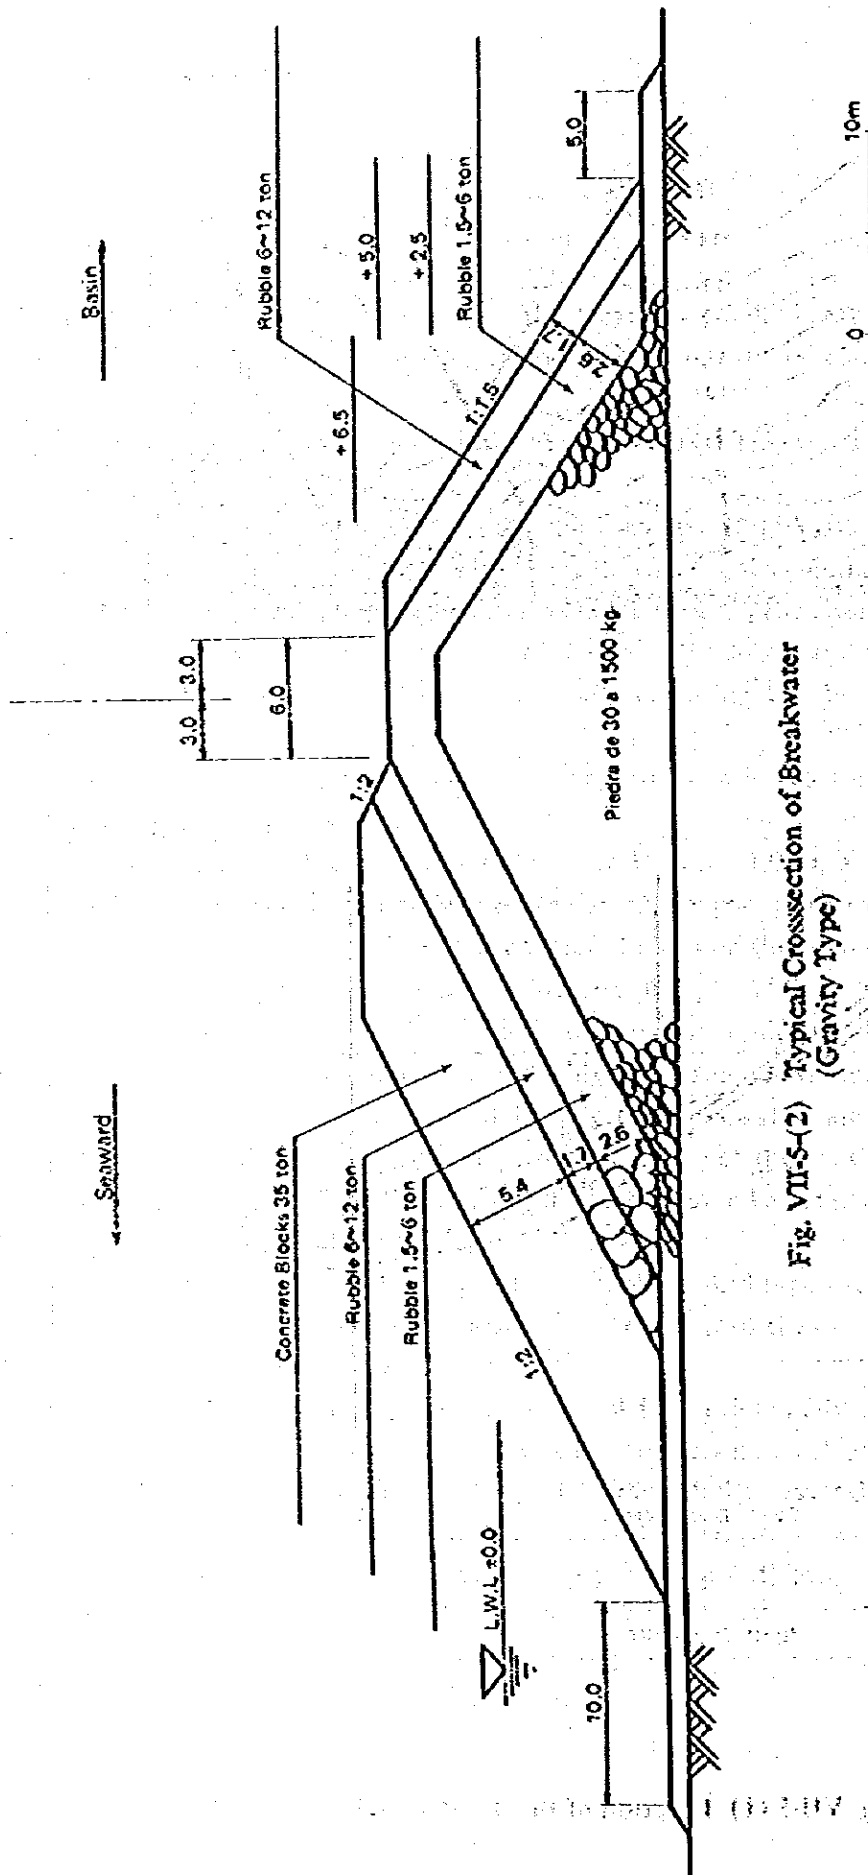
(2) Typical Crosssection of Breakwater (Gravity Type)
